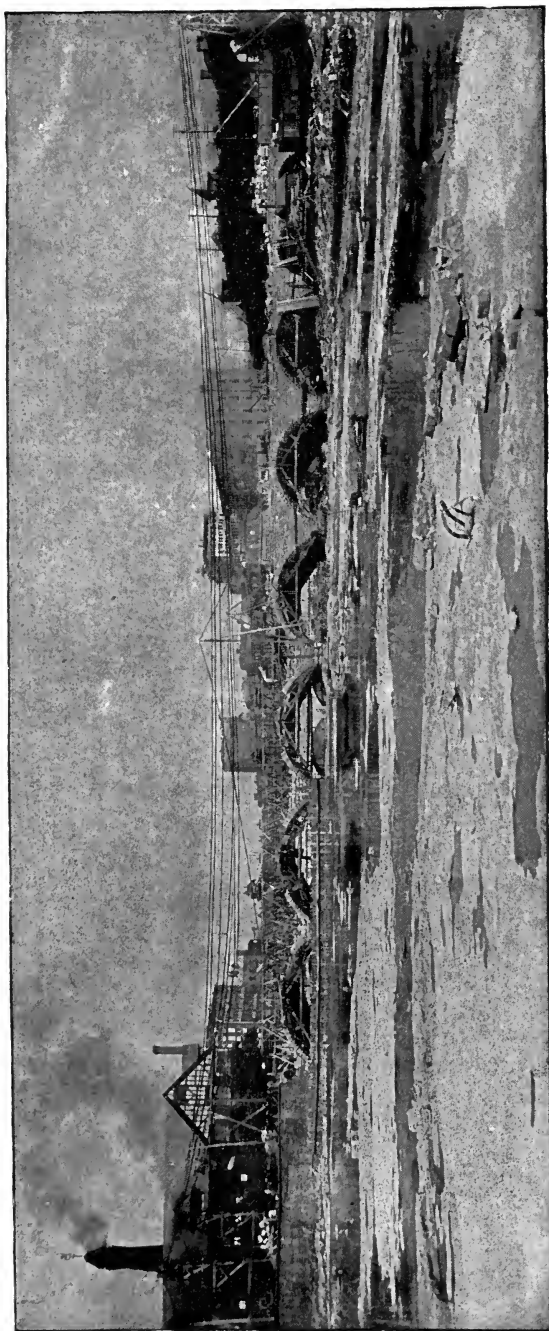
VIEW SHOWING CABLEWAY BEING USED IN BRIDGE REDUCTION AND RECONSTRUCTION.
